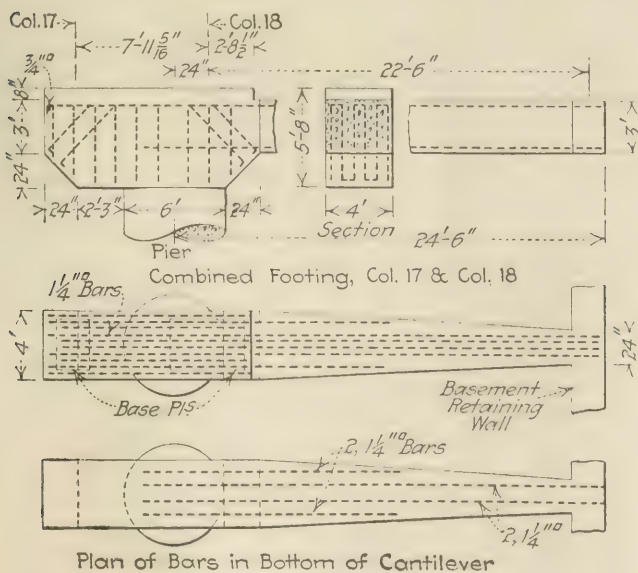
DETAILS OF CANTILEVER GIRDERS TO CARRY PARTY-WALL COLUMNS
